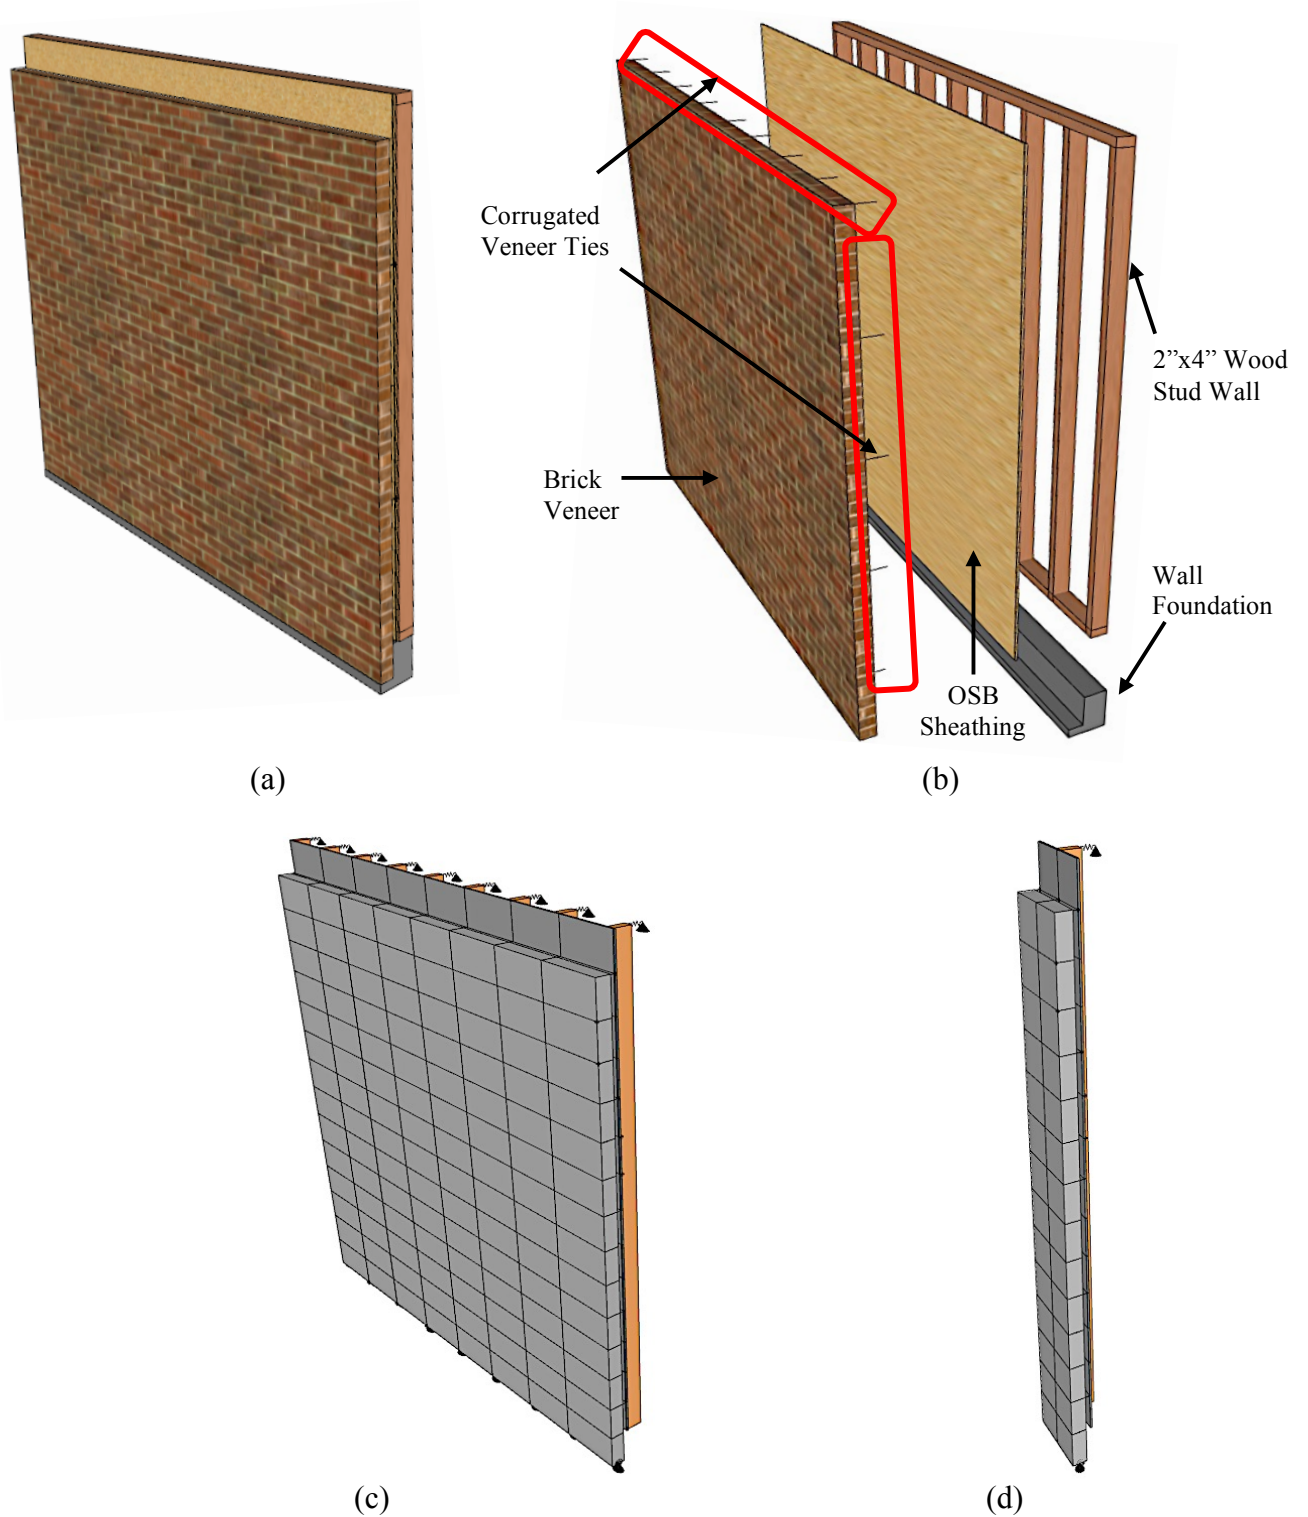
Renderings of brick veneer wall: (a) Actual wall as constructed, (b) Actual wall with individual elements labeled, (c) FE veneer full wall model, and (d) FE strip wall model.
